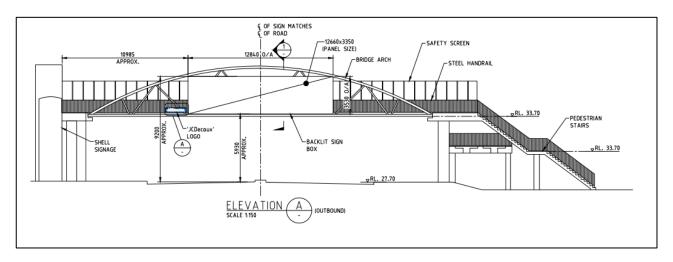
| Sign elevation – east (Source: Revised architectural drawings 23/10/24)
